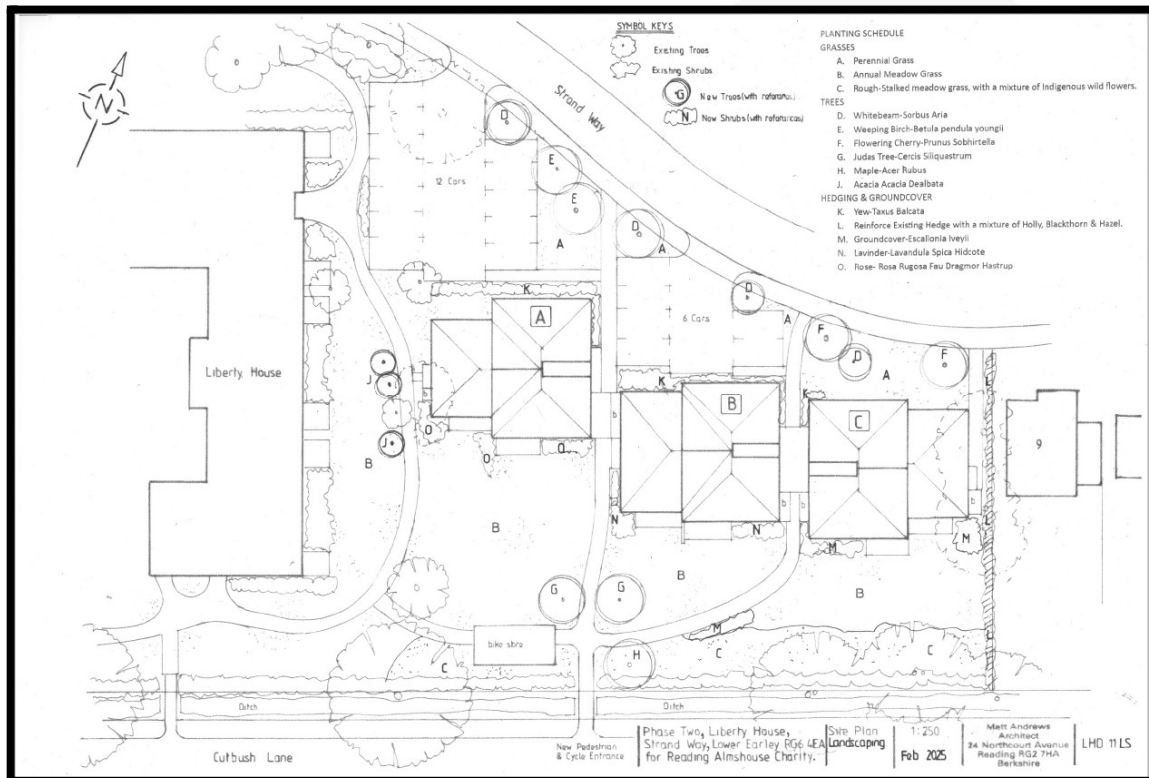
Proposed scheme, LHD 11LS (Matt Andrews Architect)
